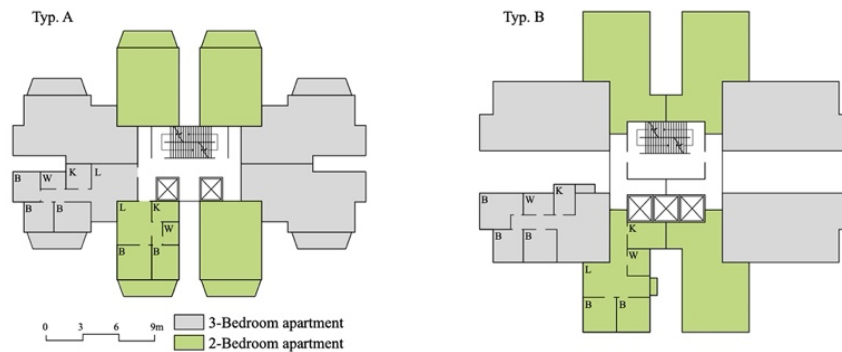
A: Plan of tower building in East Lake New Village. Source: illustration adapted from Yu (2012: 46). B: Hong Kong “Home” Block A, Sun Lai Garden, Ngau Chi Wan. Source: illustration adapted from Ding (1986: 14–19).
